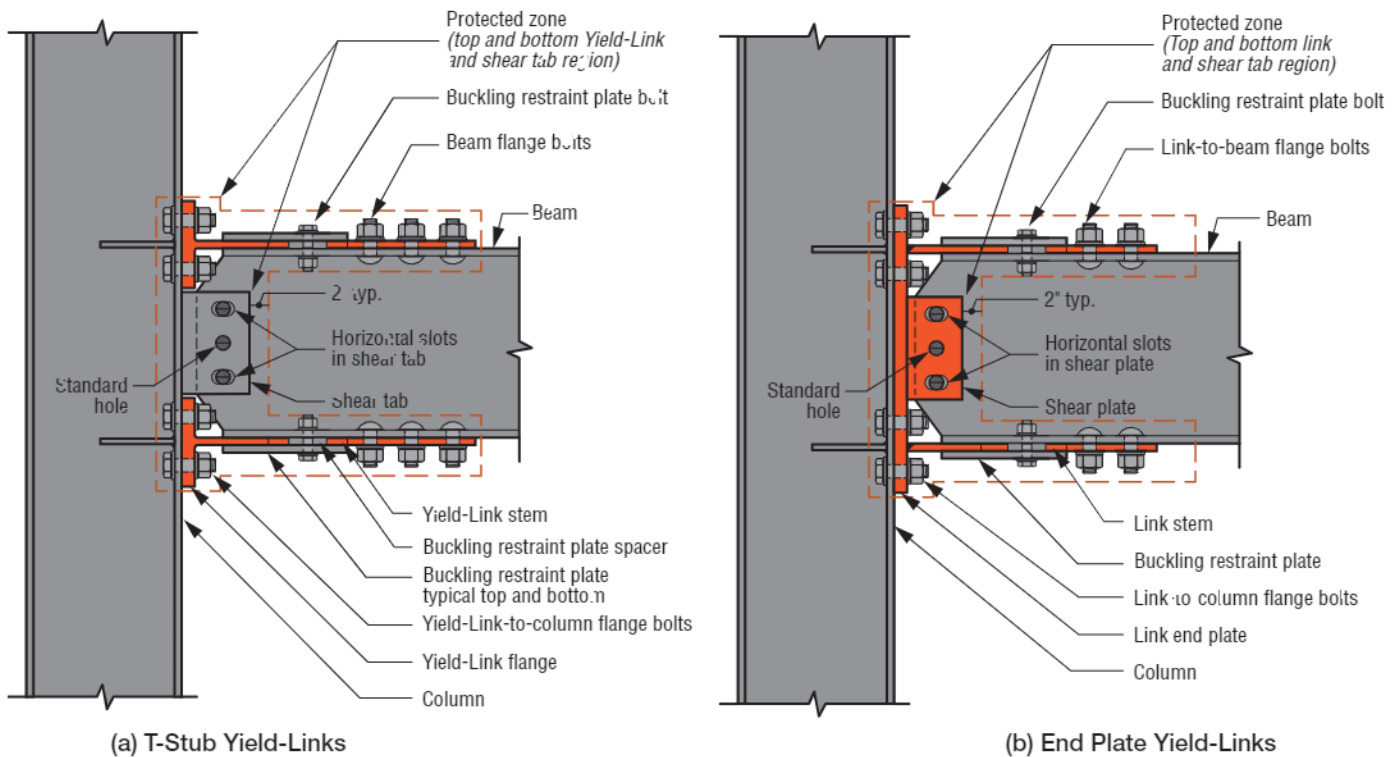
4 — Protected Zone for Strong Frame SMF Connection
